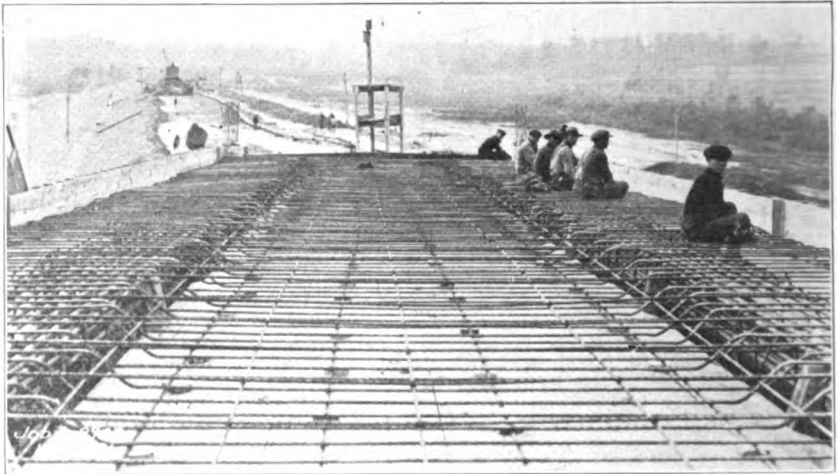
STEEL IN PLACE FOR FLOOR SYSTEM FOR ONE SECTION OF TAYLORSVILLE SPILLWAY BRIDGE
